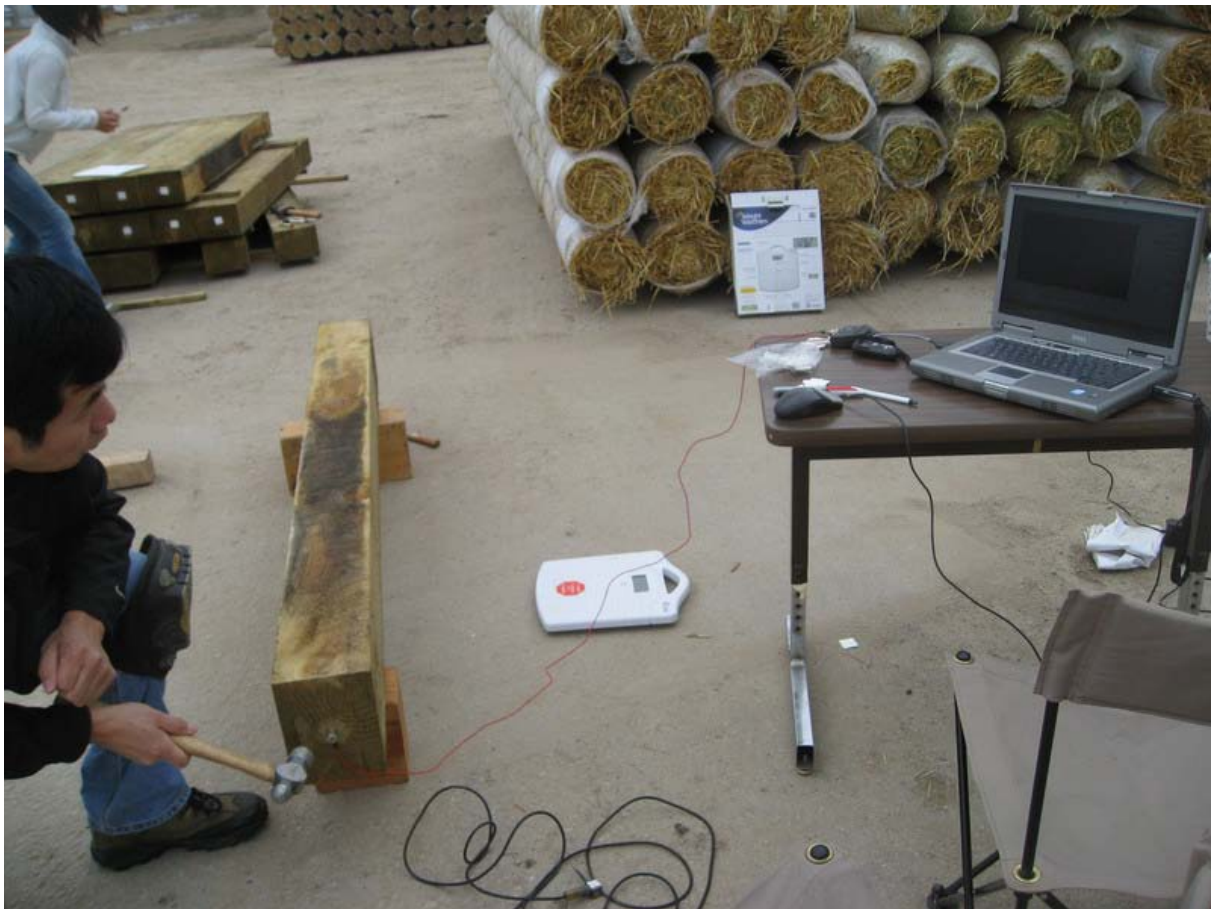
Evaluating new posts prior to installation at the bridge site.
